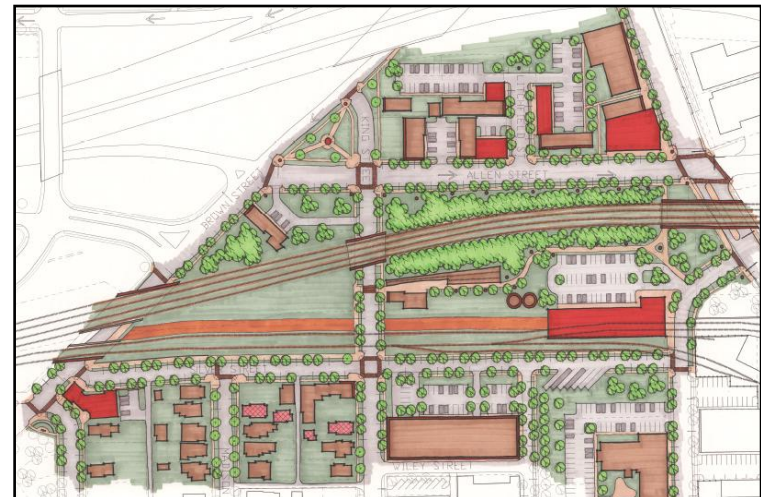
RRCDC Susan B. Anthony Community Vision Plan
